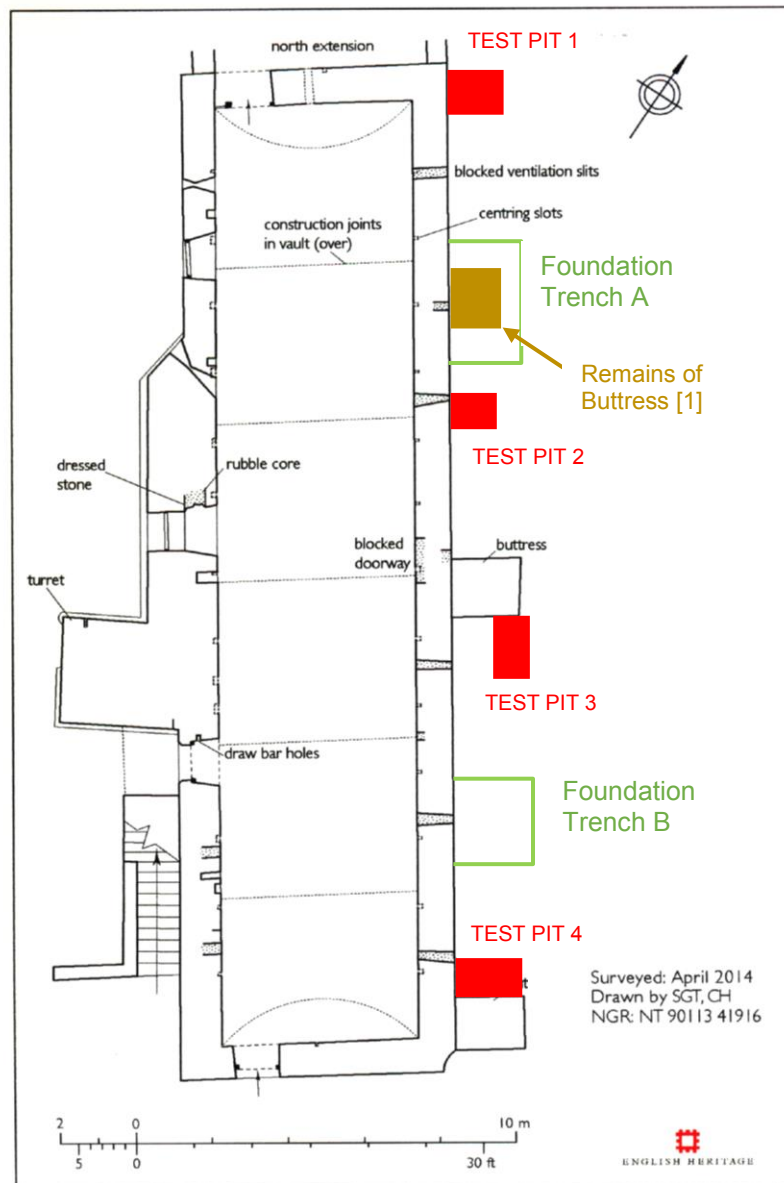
Location of Foundation Trenches A and B (outlined in green) for the installation of new buttresses against the unstable east wall of the building, and the remains of an earlier butress in Foundation Trench A. Previous Test Pits are in red. Plan with thanks to English Heritage (2014). Not to scale in this figure.
